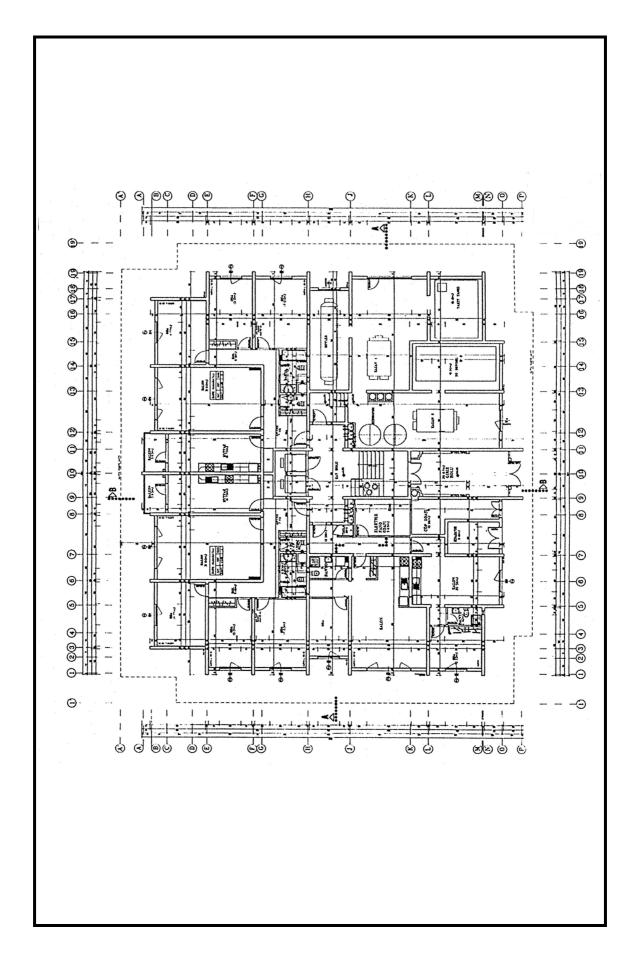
Mavişehir II; Flamingo Ground-Floor Plan
